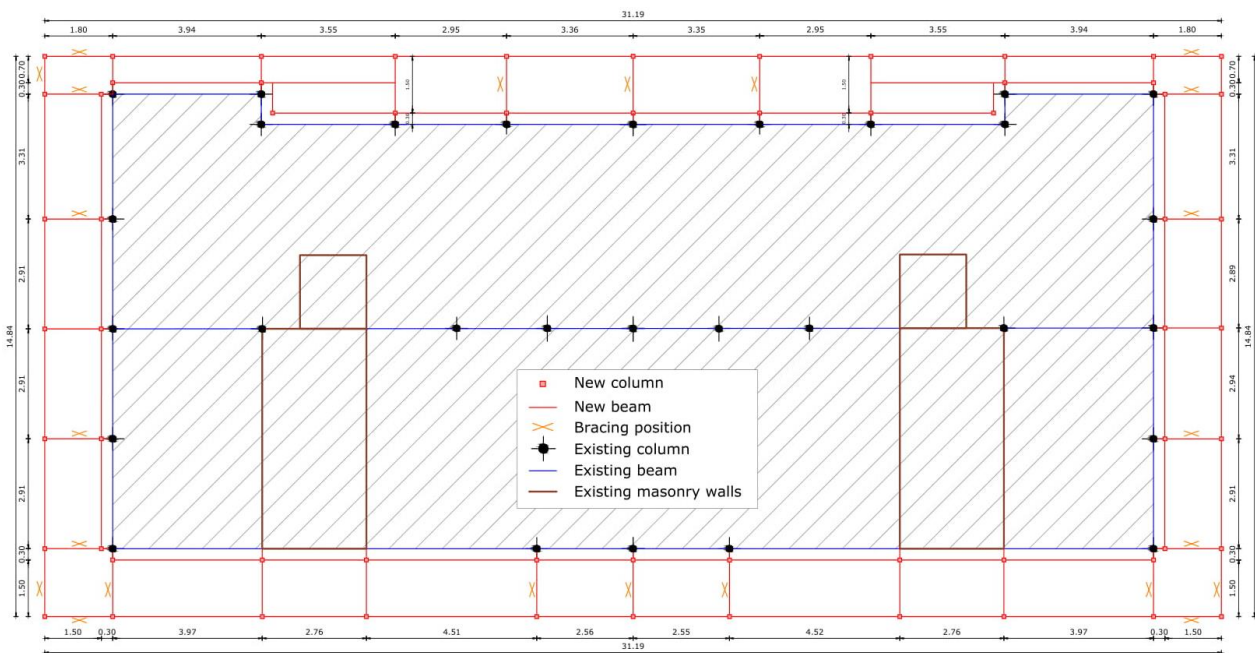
Planimetric scheme of the exoskeleton, identifying the profiles used and indicating the positions of the bracing (m as units)
